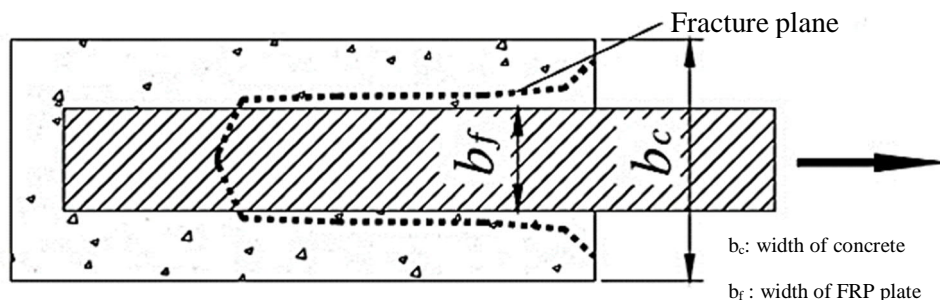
Typical fracture plane for bonded plate to concrete (Lu et al., 2005).
